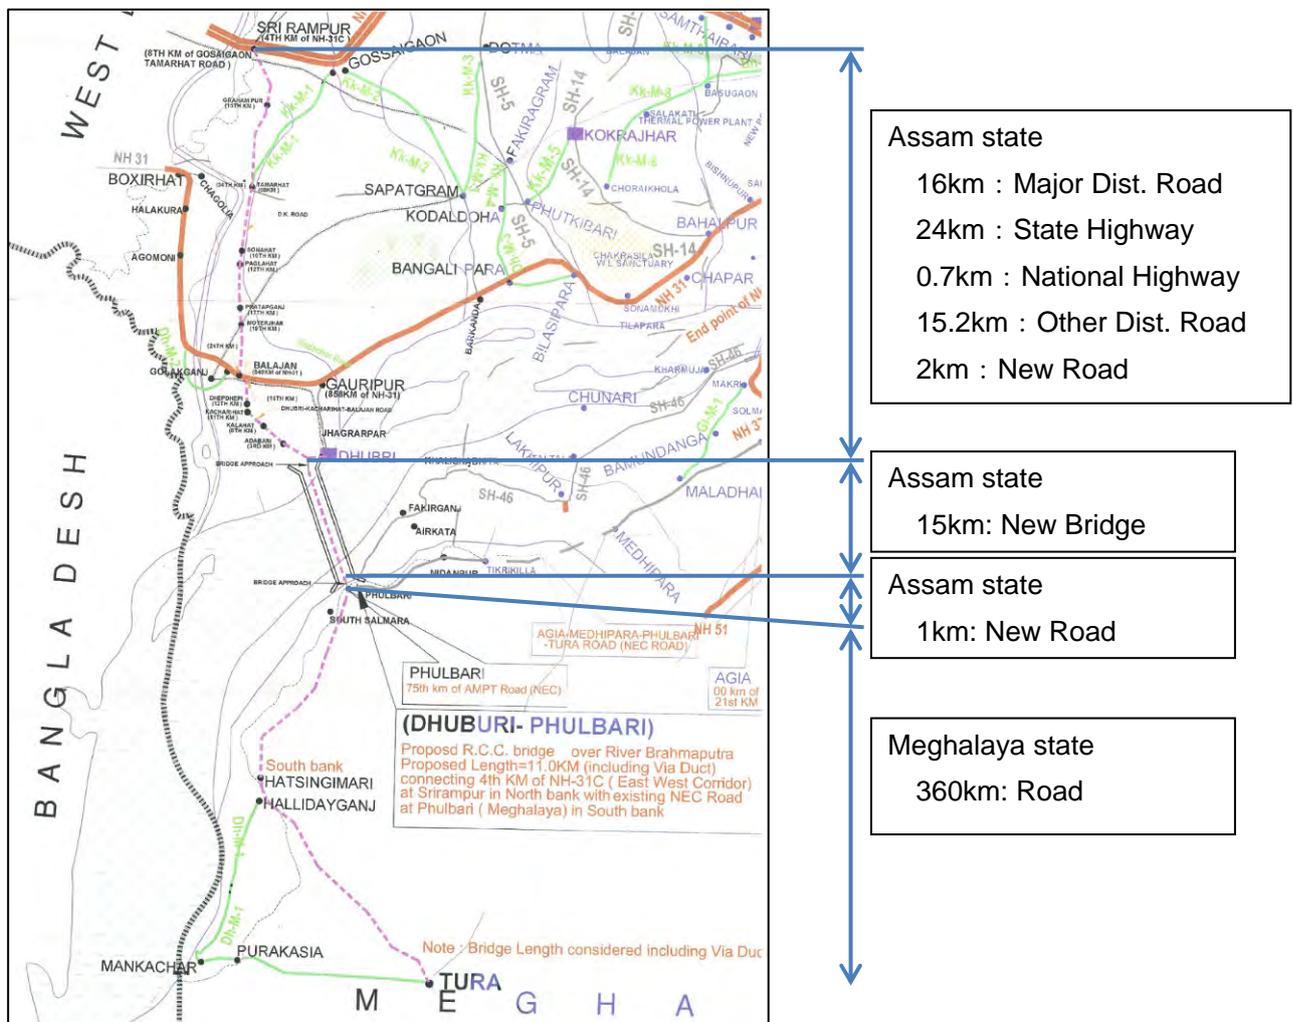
Plan of Dhubri-Phulbari Bridge (3/4)
